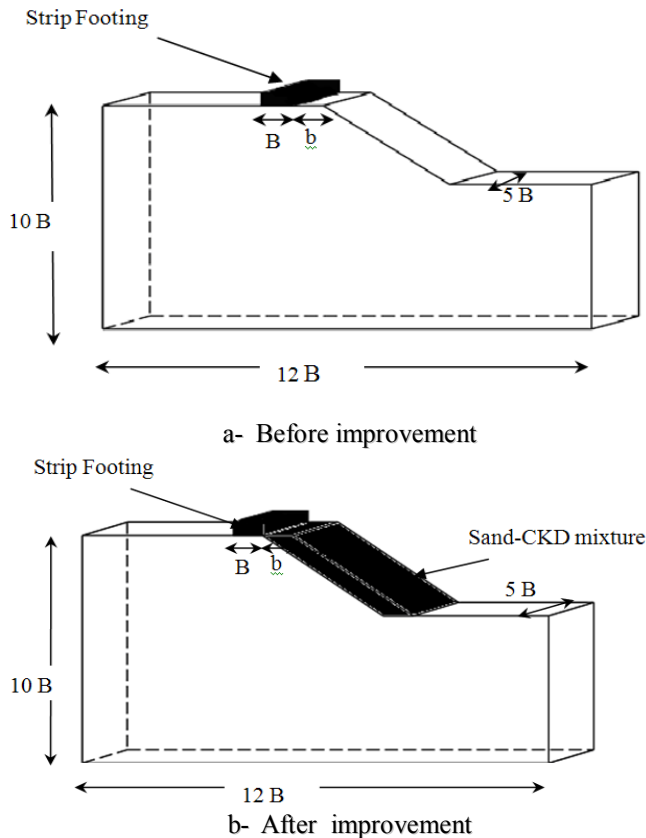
Strip footing slope system before and after improvement with sand-(CKD) mixture layer.
